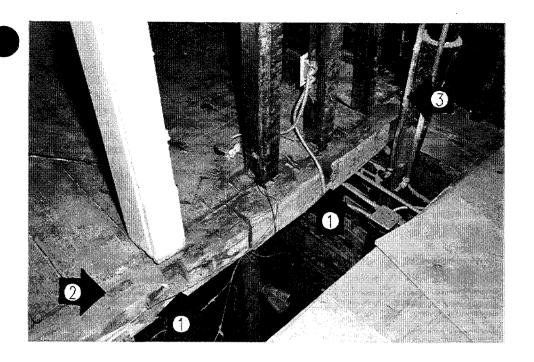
JOIST POCKETS AT THE SOUTHWEST PORCH
